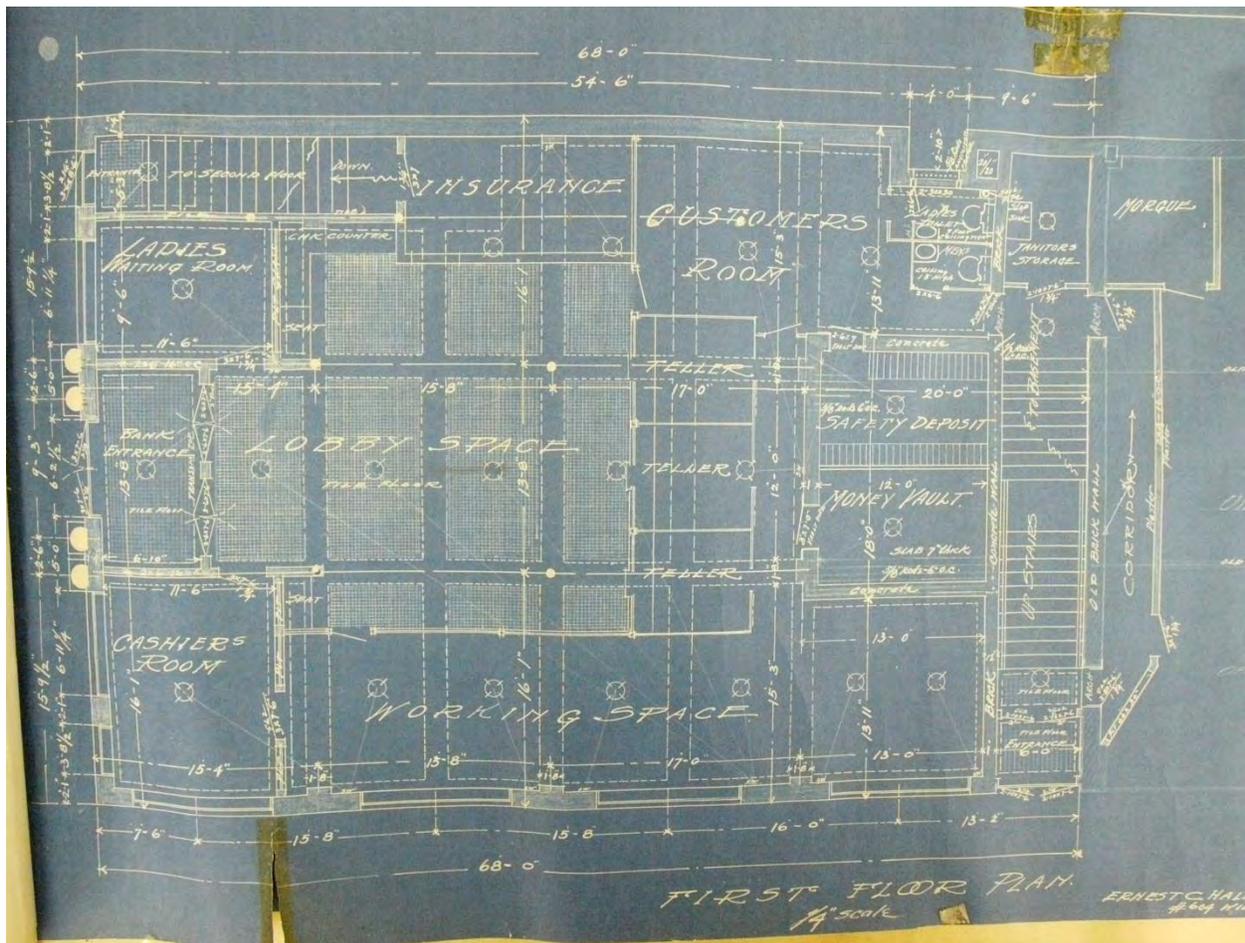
First floor plan 1920 addition, source: Northwest Architectural Archives
